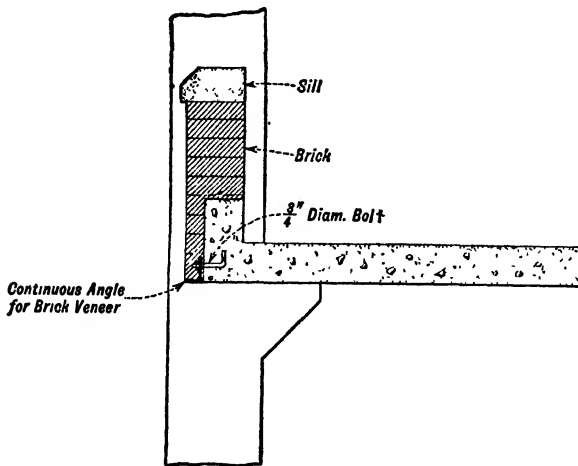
Wall Beam above Slab. (See p. 382.)
